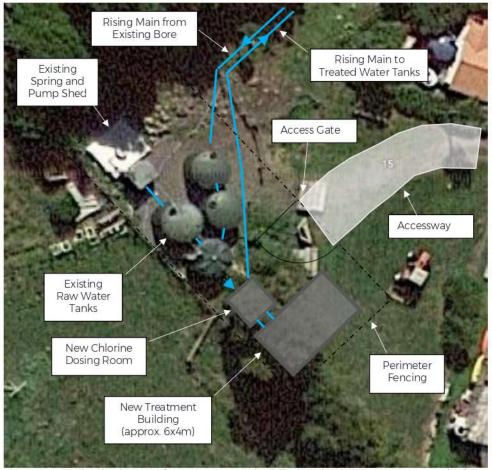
Indicative layout of new treatment building and existing raw water tanks for Option 1b
